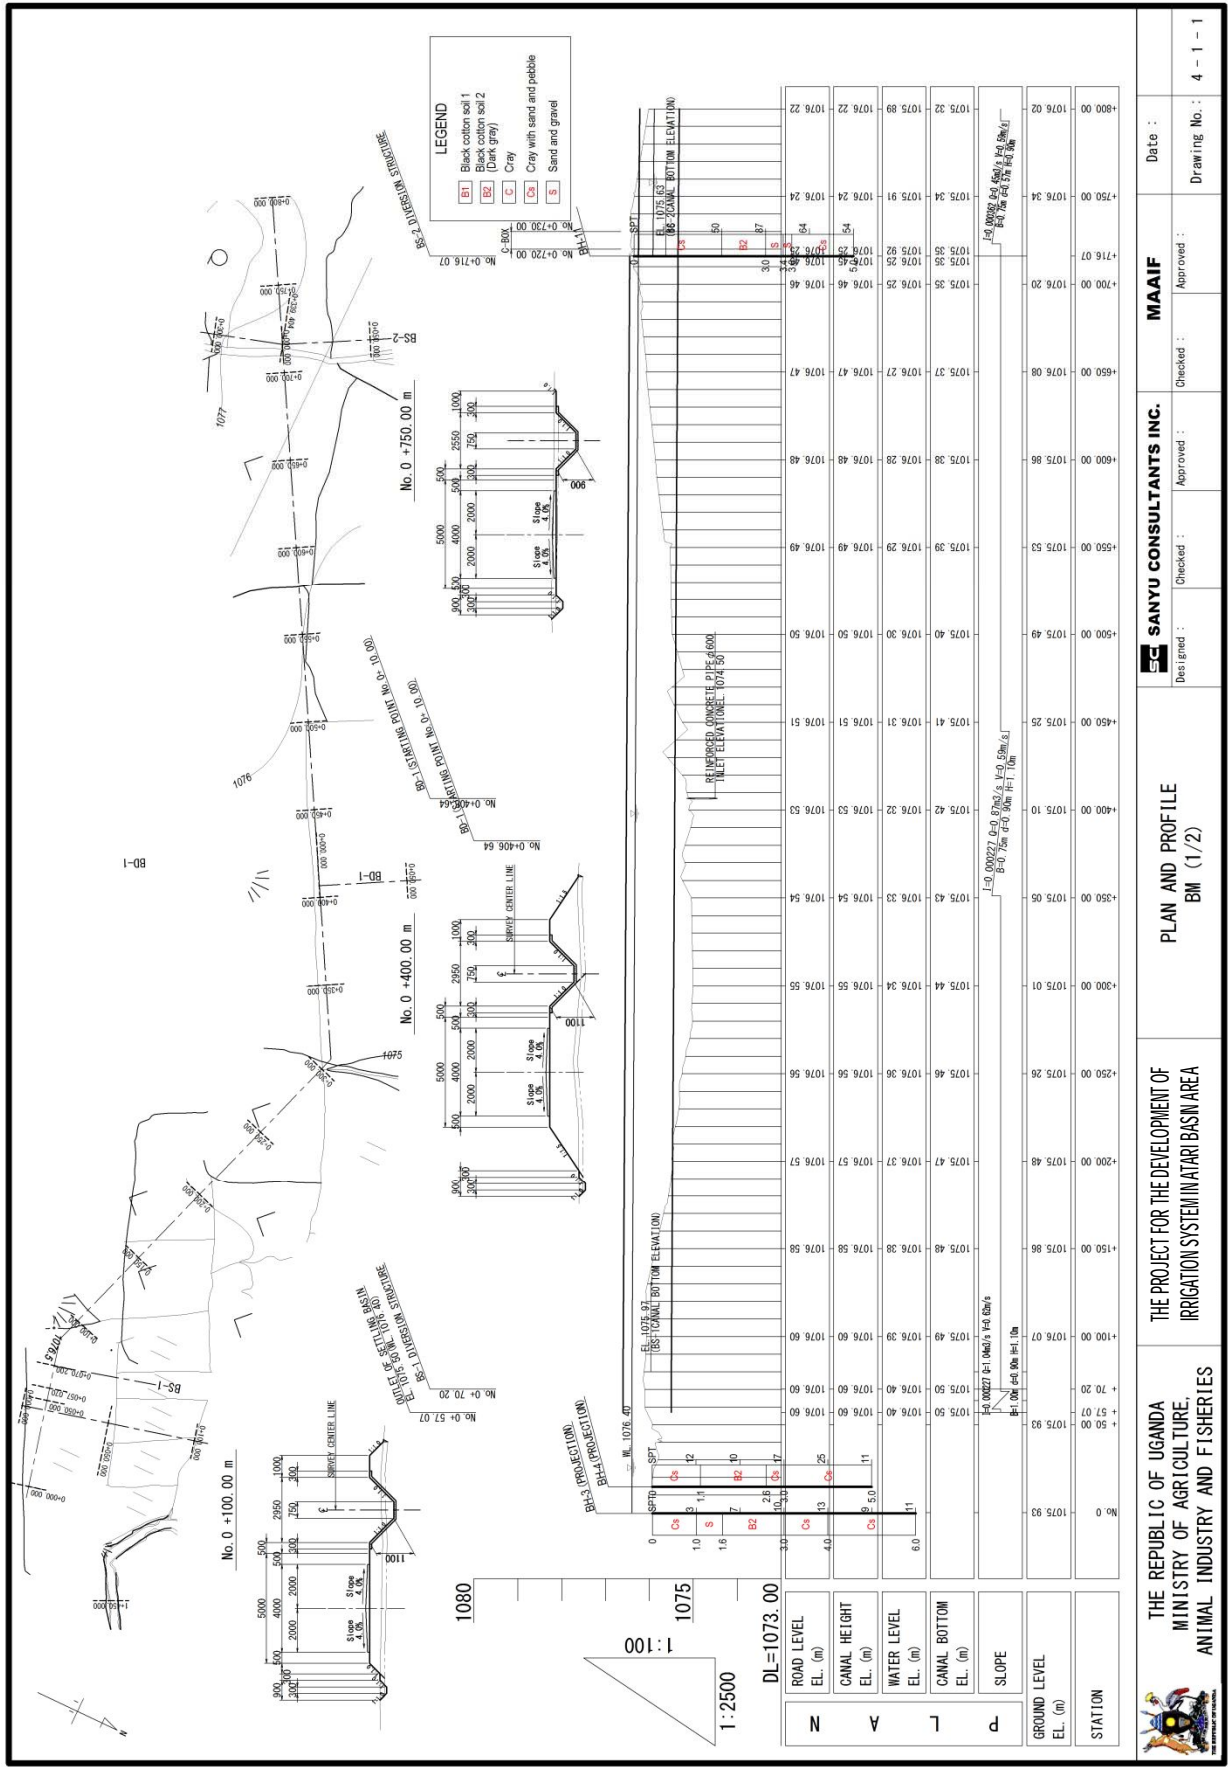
Longitudinal Profile of BM (1/2)
